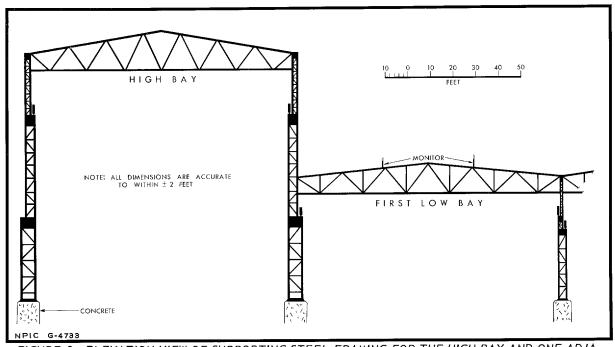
ELEVATION VIEW OF SUPPORTING STEEL FRAMING FOR THE HIGH BAY AND ONE ADJA-CENT LOW BAY AT VERKHNYAYA SALDA AND KUYBYSHEV METALLURGICAL PLANTS.
